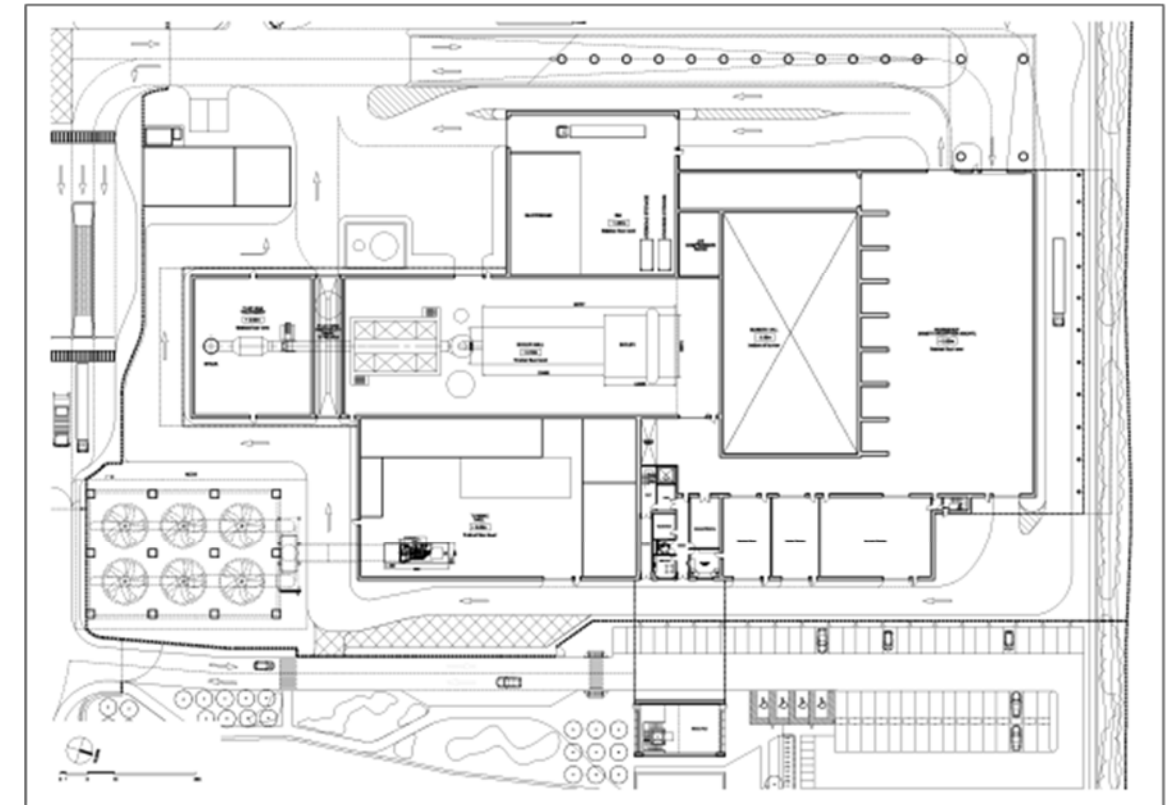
Proposed ERF ground level floor plan - extract from drg PL110
